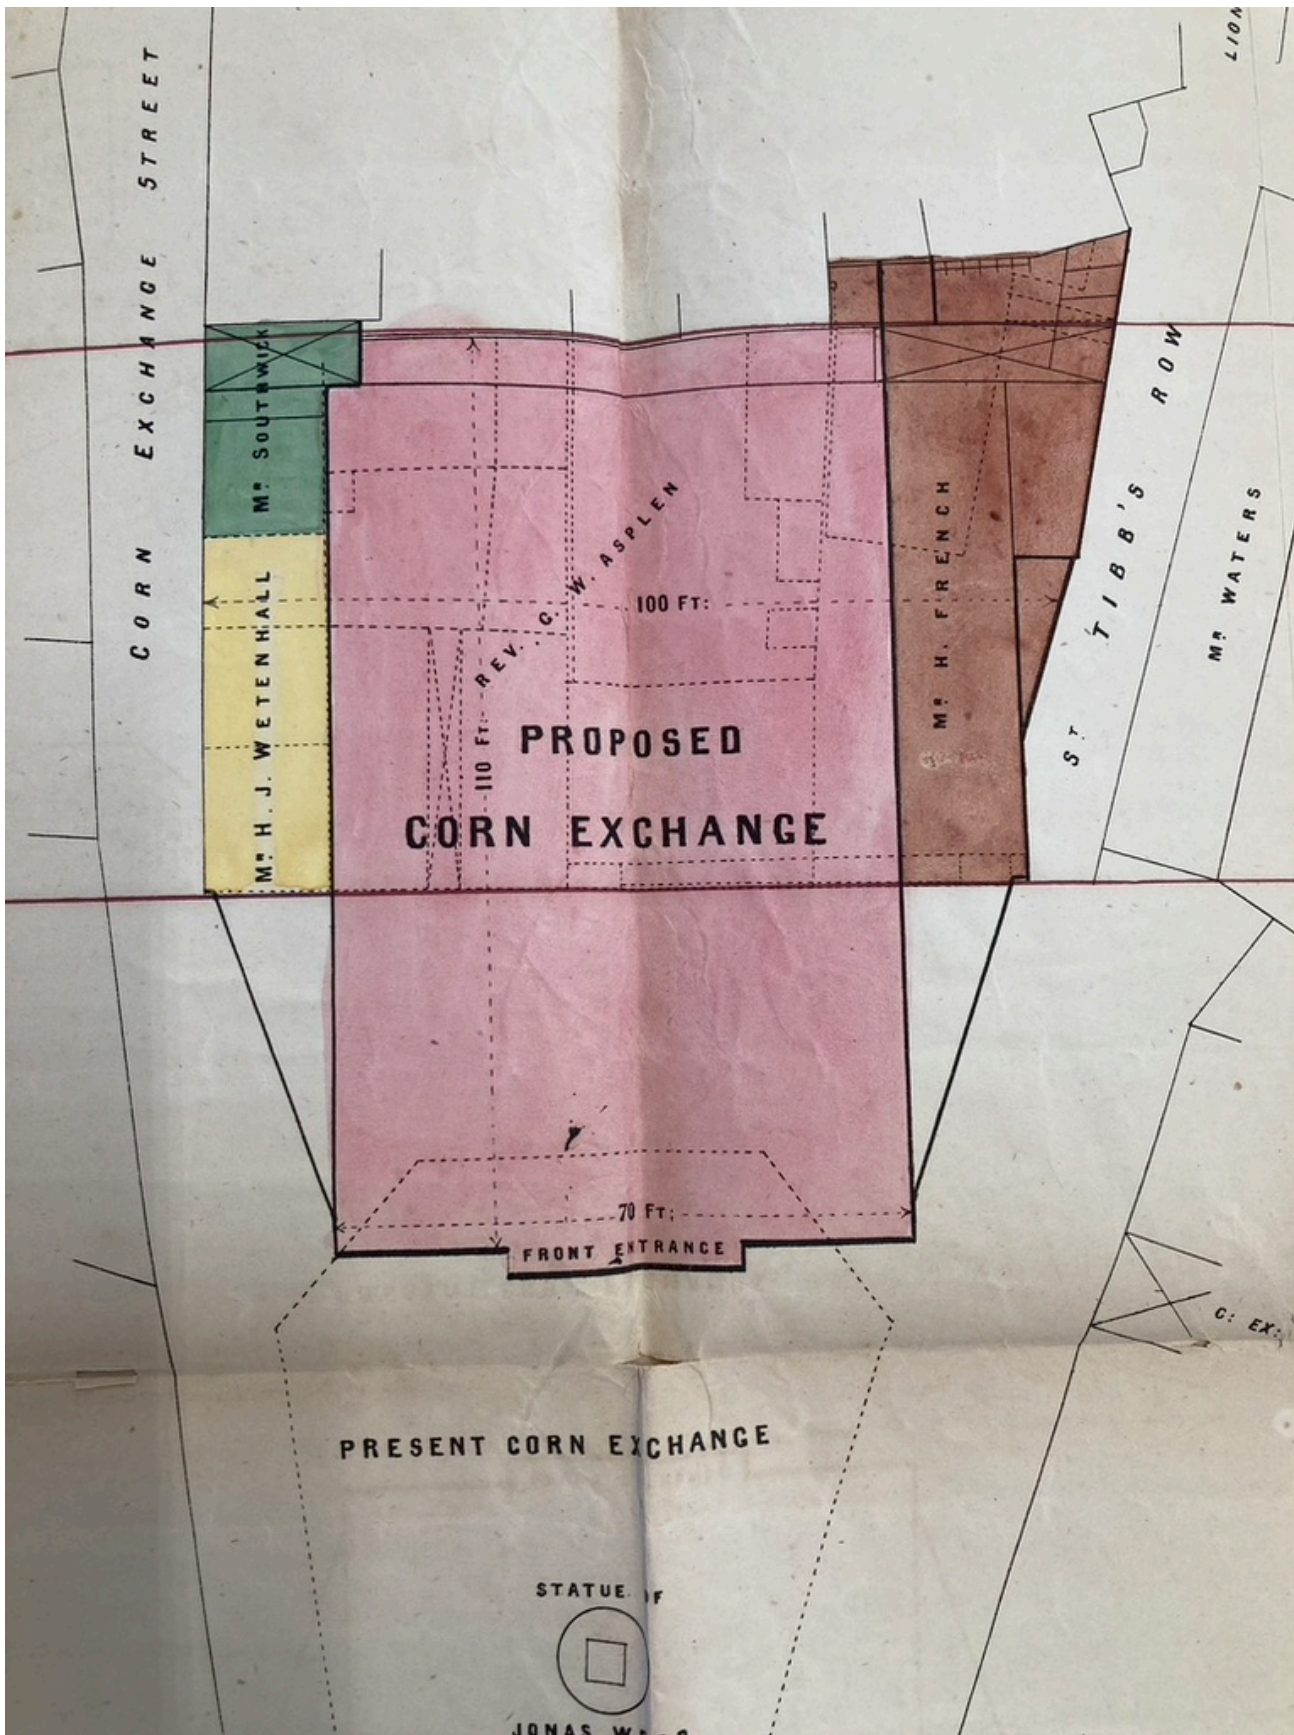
St Andrew's Hill site. Detail from 6.2, Plan of proposed site for New Corn Exchange by R Reynolds Rowe, town surveyor. April 1869 (CB/2/CL/7/40/60)
